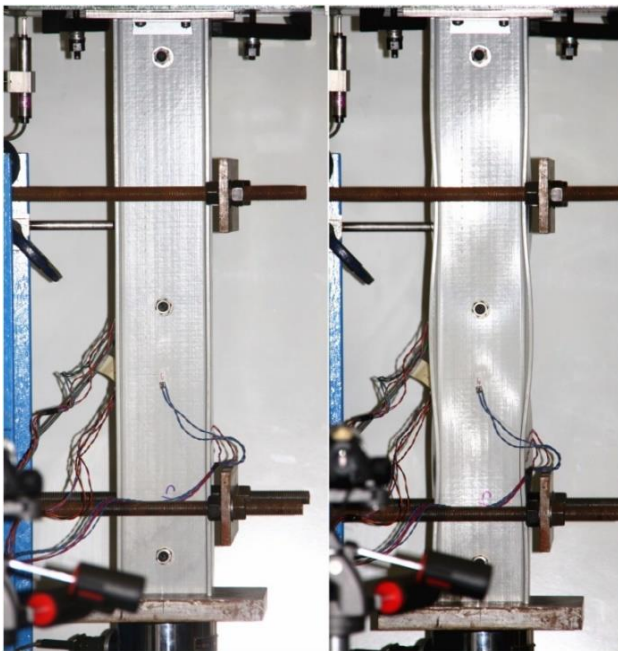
Local buckling test on C1 specimen: (a) under compression; (b) local buckling failure.
